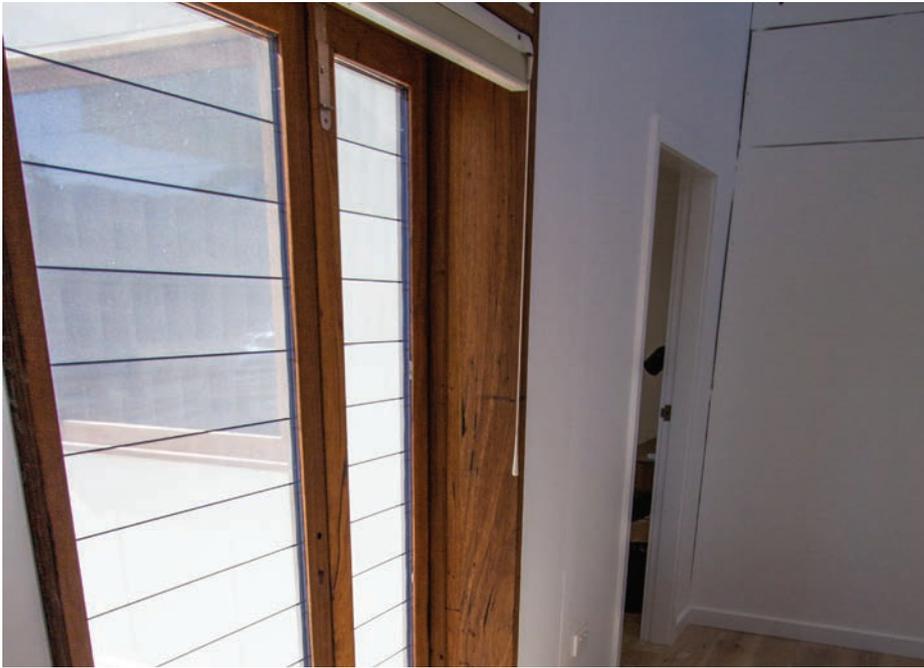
Microshade Strips Visible on Doors on the South Facing Side of House
